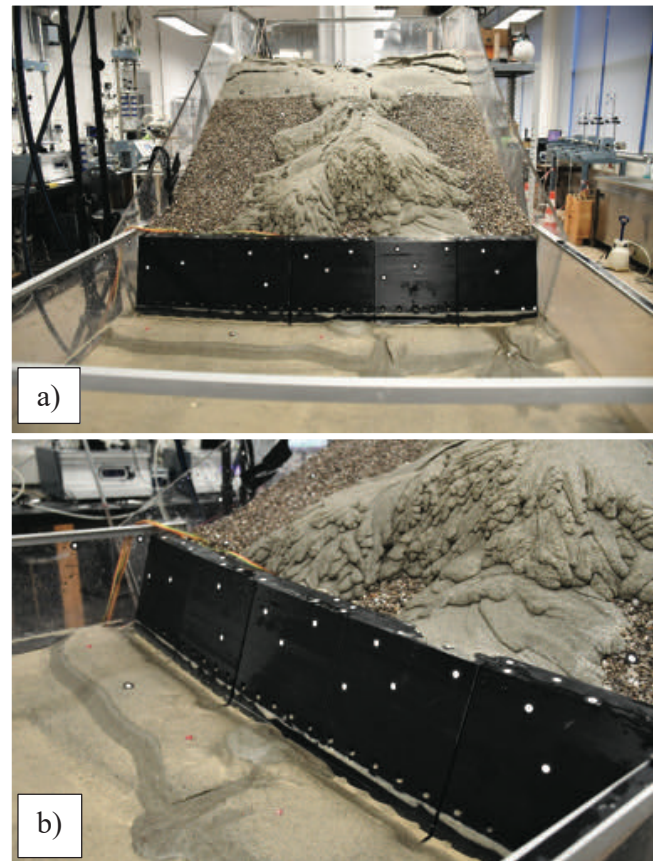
a) a global collapse of the slope in the test on the sandy slope without applied gravity wall with opening of nozzles at the upper part of the slope with the intensity of 122.8 mm/h after 138 min of rainfall; b) a view at the applied gravity wall at the end of the test; there are visible movements along the gravity wall and zone of uplifted Rankine passive zone in a front of gravity wall foundations.
